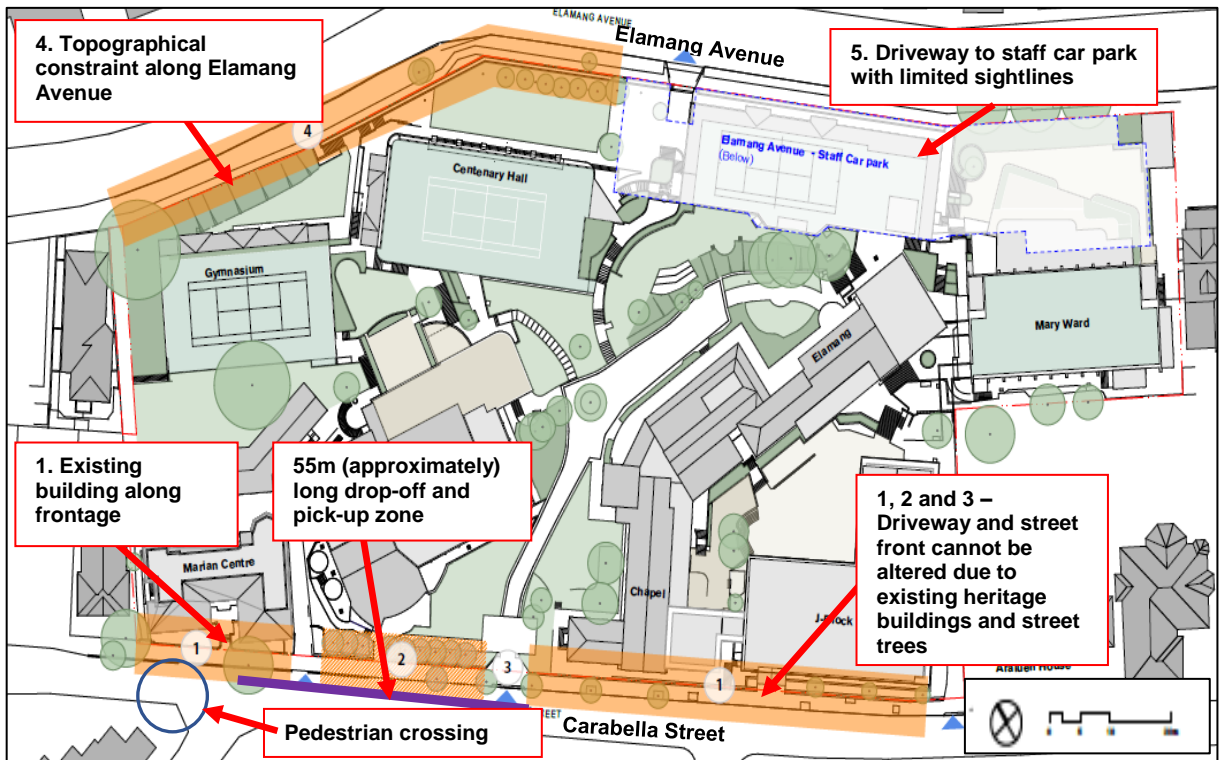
Drop-off and pick-up zone locations, site constraints limiting on-site drop-off and pick-up and the walking route from the bus stop to the site (Source: Applicant's RtS)
